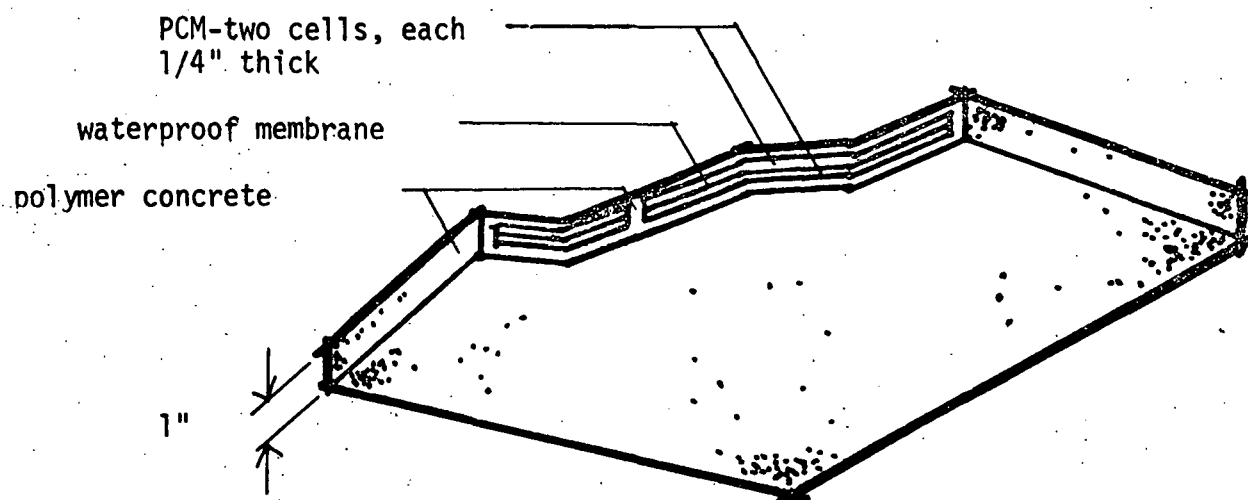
SOLAR CEILING TILE CONSTRUCTION
